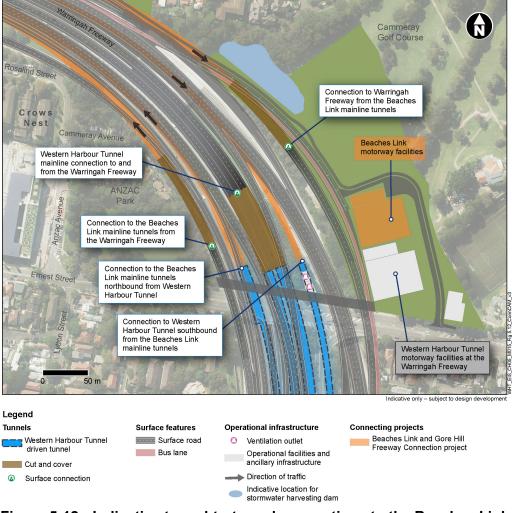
Indicative tunnel-to-tunnel connections to the Beaches Link and Gore Hill Freeway Connection project
